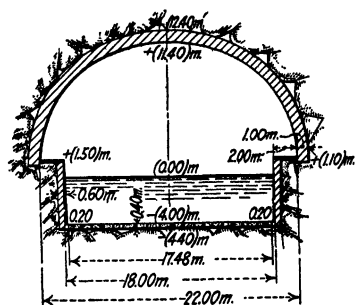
TUNNEL CROSS-SECTION, TYPE 1 OR 2.
